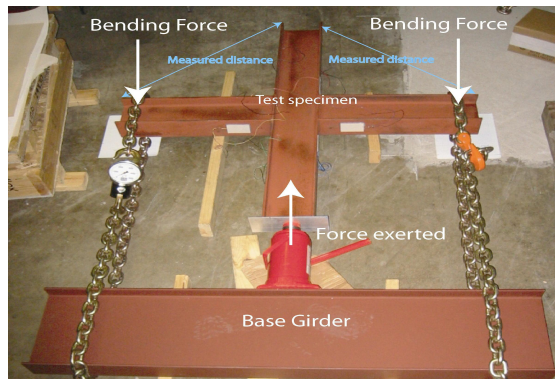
Welded Steel Moment Frame Specimen and Testing Method
